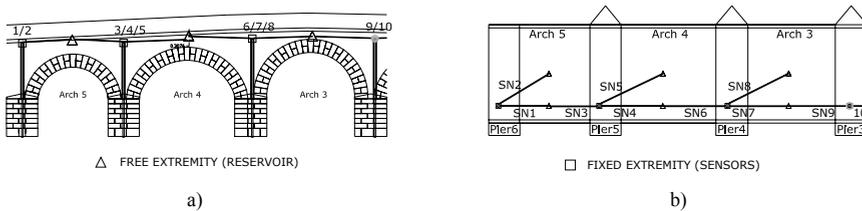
Level sensors: (a) elevation layout, (b) plan layout.
